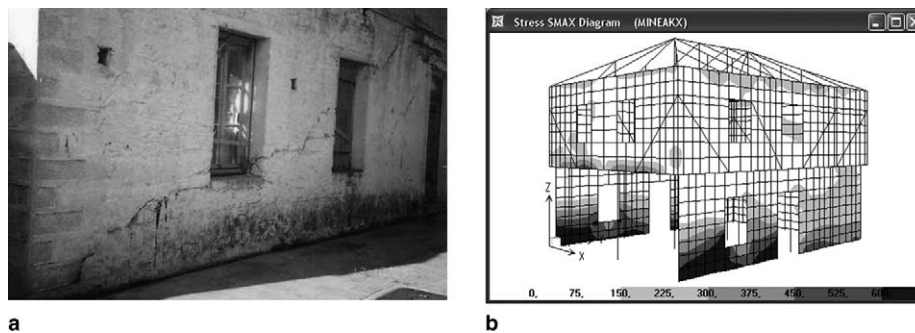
(a) Typical damage of stone masonry, in case of demolished masonry along one transverse façade. (b) Distribution of principal tensile stresses (in kPa), calculated for a similar case. Seismic action perpendicular to the wall under consideration.
